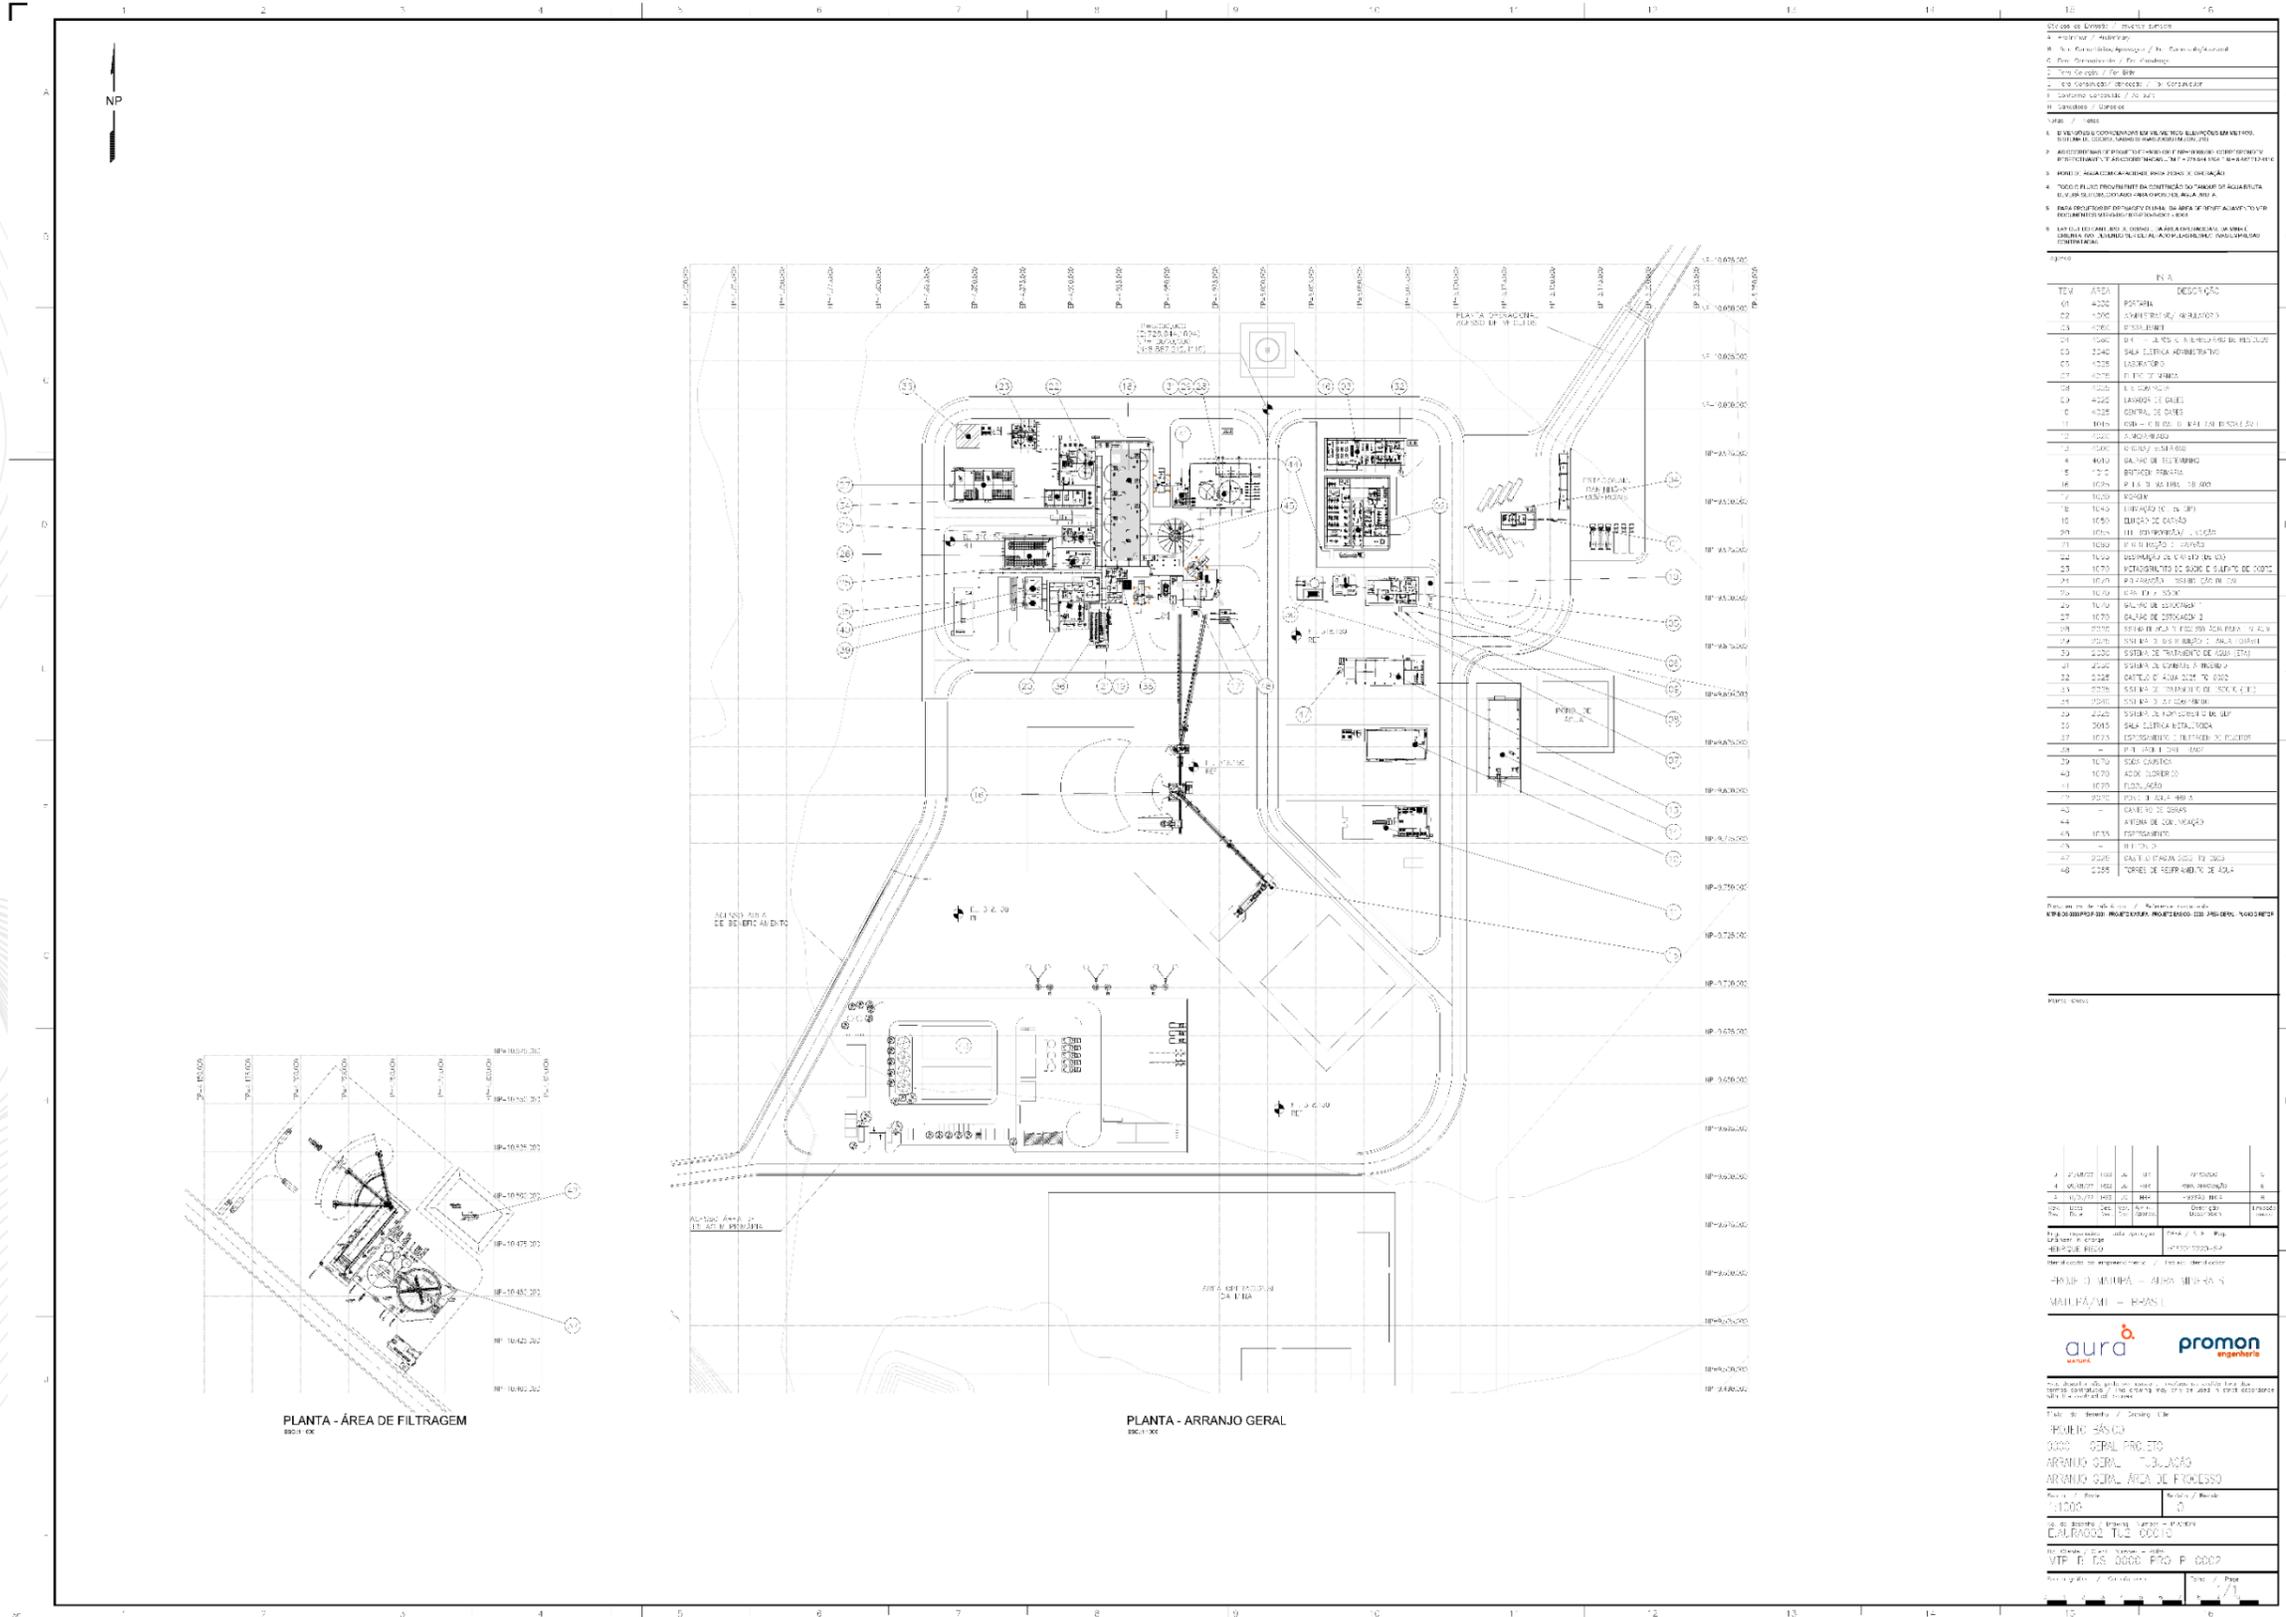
Overall Site Plan (MTP-B-DS-0000-P-0002-RB)
